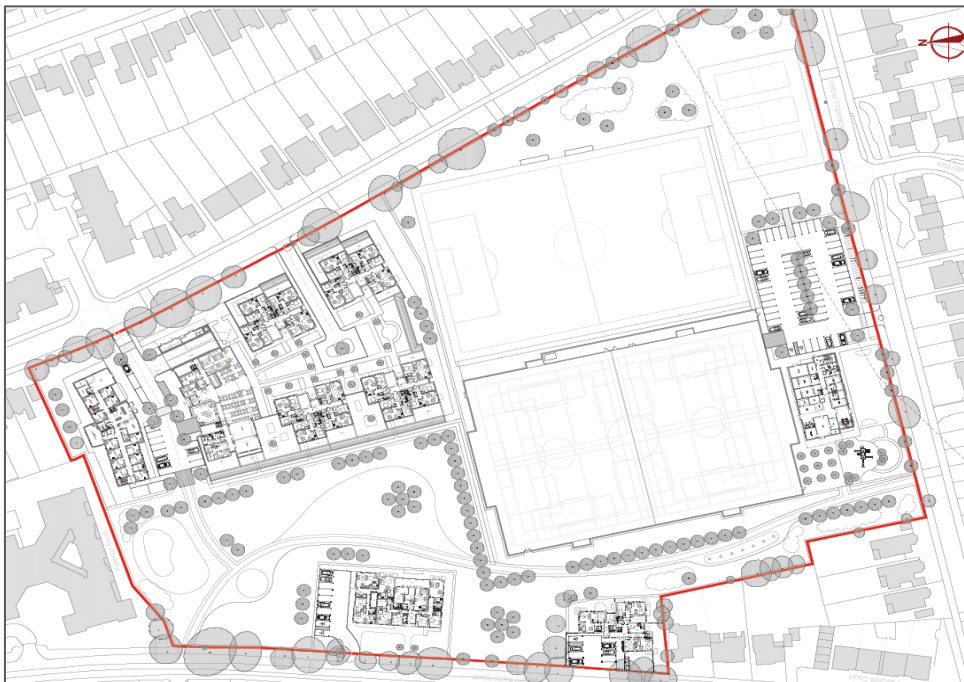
The Proposed Development Site Plan (Quantum Group Proposed Site Plan – Red.900-SK02)
